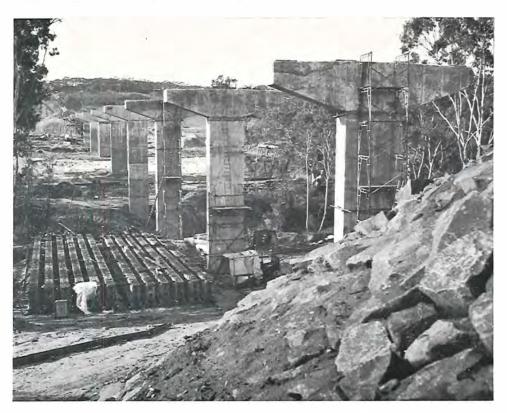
Construction of the Glenelg River Bridge, Princes Highway West, Dartmoor.
